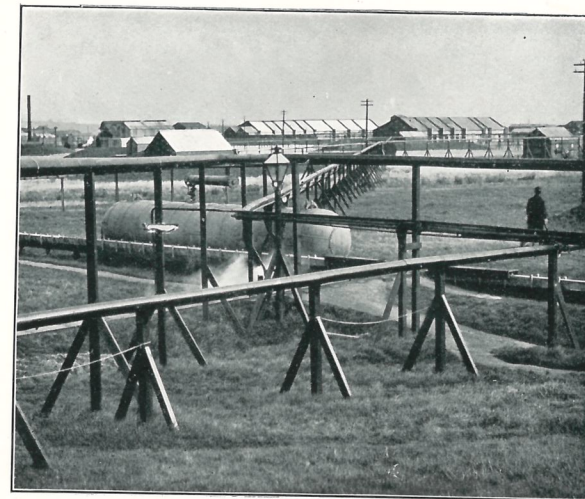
BUILDINGS AND PIPE CONNECTIONS. COTTON POWDER WORKS.
